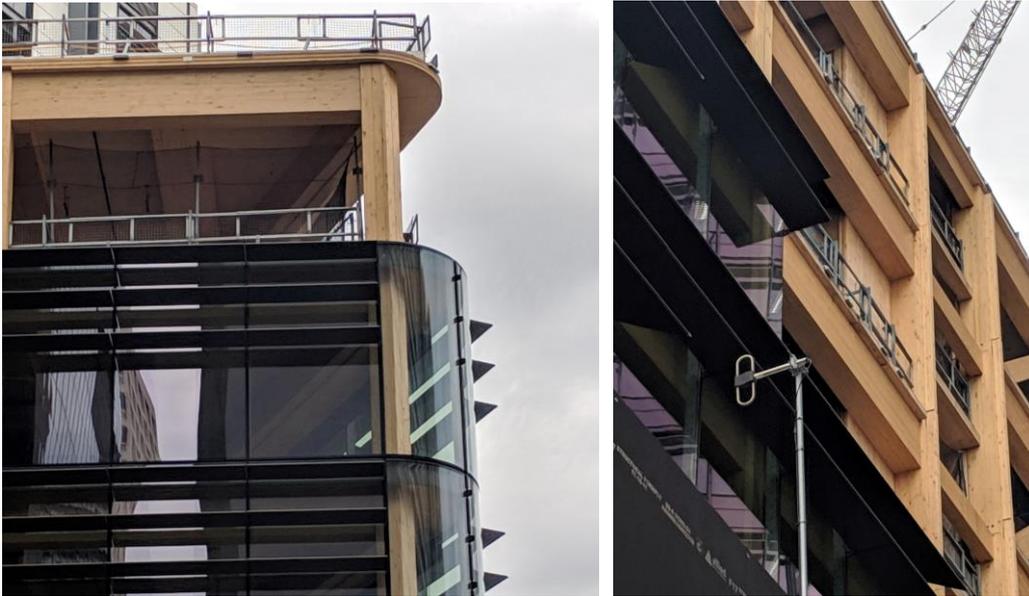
Example of mass timber building under construction using CLT slab construction (Photo: Carl Pettersson)
